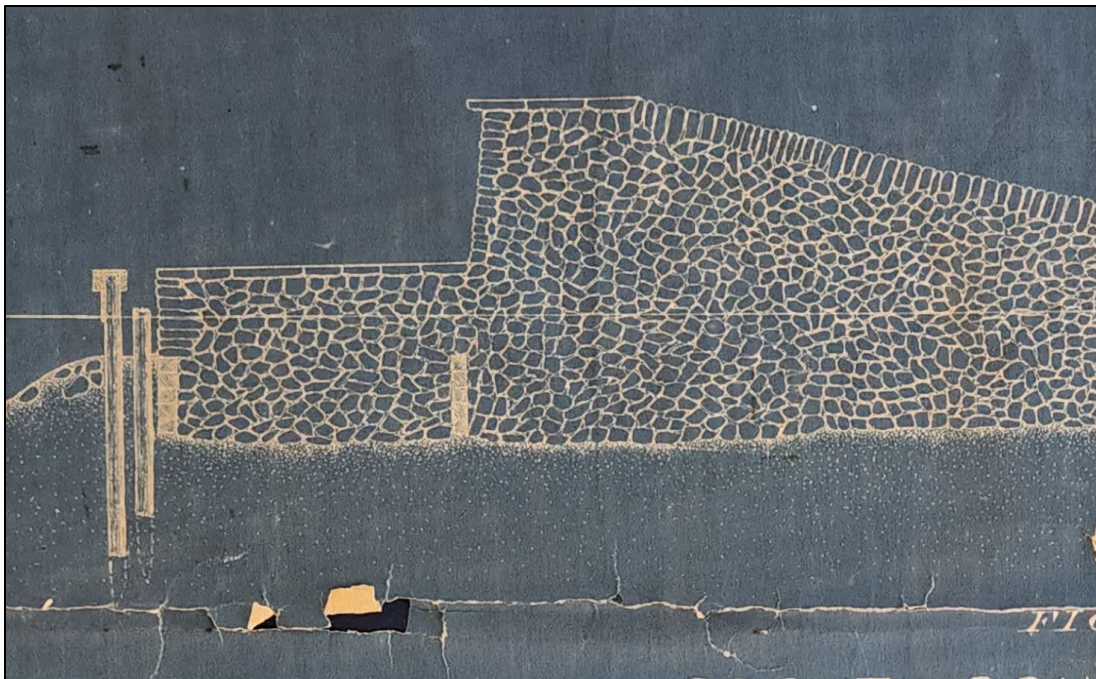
Detail of plan of mole showing incline plane, top of stone wall, and stone tow path, 1870. (Buffalo District files. Public domain.)
